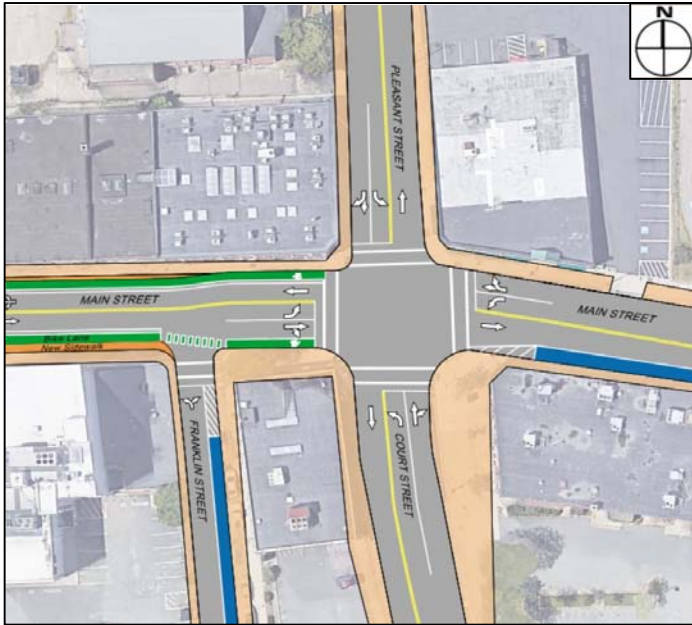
Main Street at Pleasant/Court Street Concept Plan
